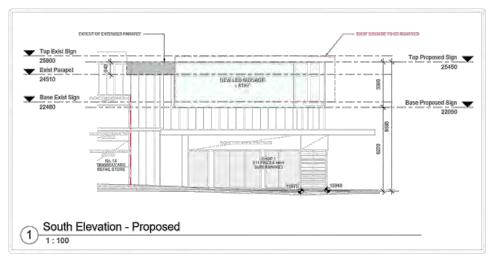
South elevation indicating alterations to parapet and amended siting of signage (Source: Legge & Legge Architects)
